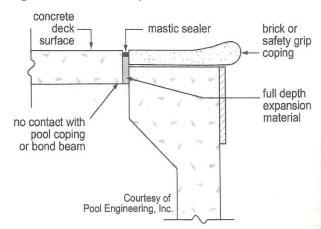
Concrete deck adjacent to pool coping. Isolation joint properly separates the slab from the bond beam and coping.
